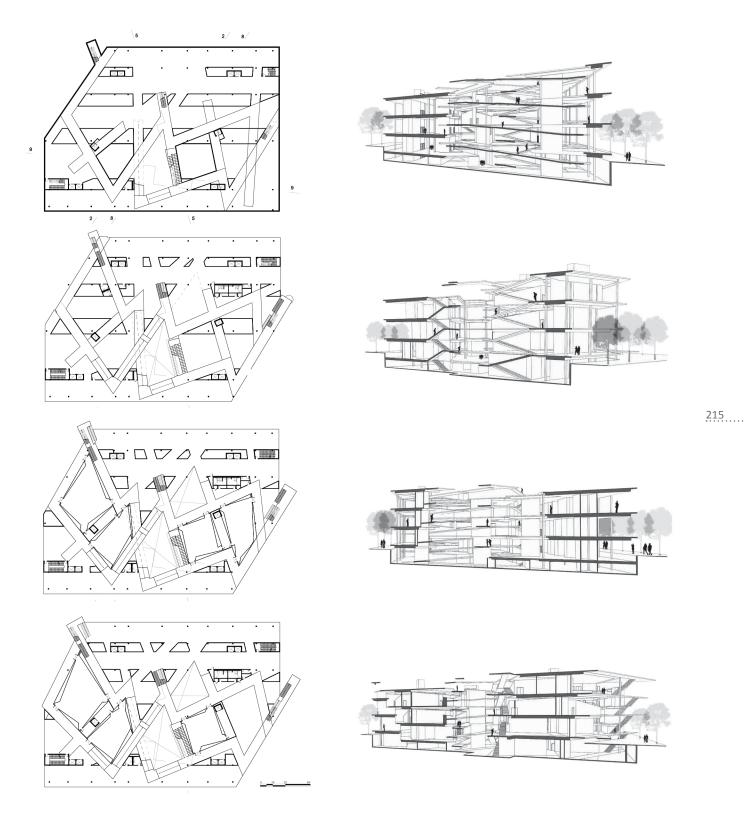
Project for a federal courthouse in Mobile, AL. a) Basement; b) Ground floor; c) Second floor; d) Third floor. (Kelly Heyer; Woody. Woodhurst).
